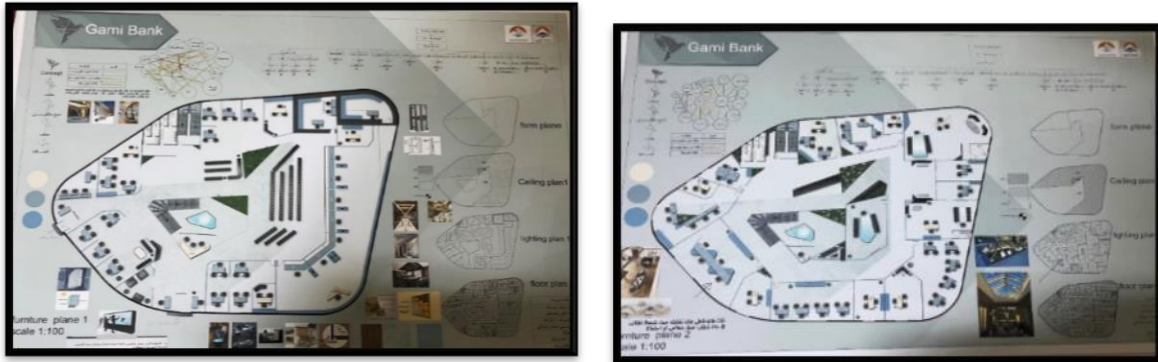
On the right: The ground floor plank, on the left: The first floor plank.
